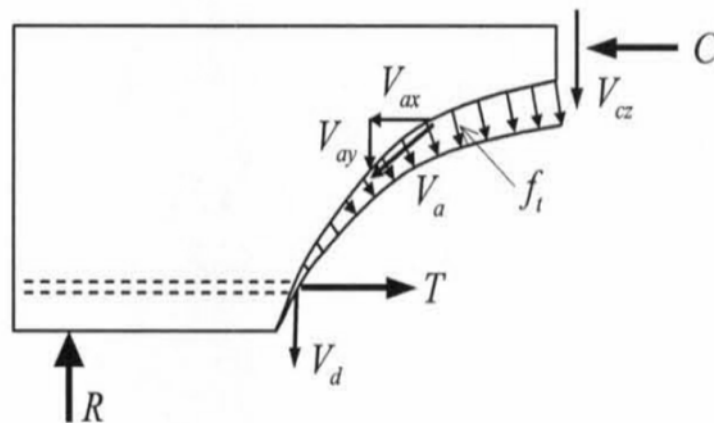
Internal forces in a cracked beam without stirrups
